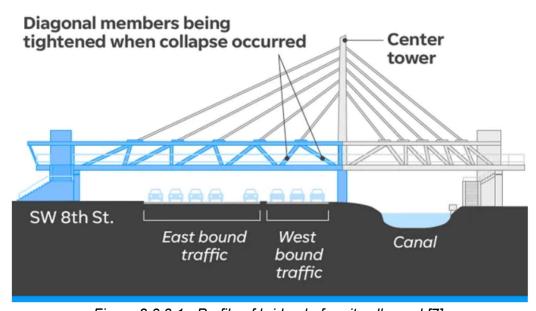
Profile of bridge before it collapsed [7]
